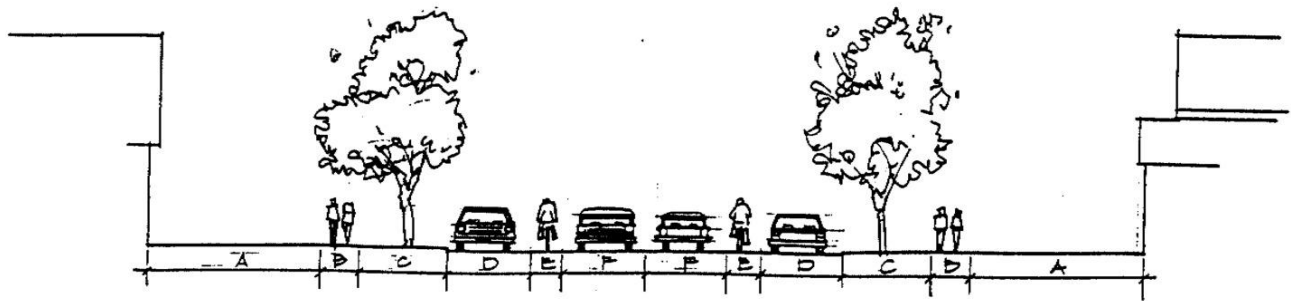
Schematic sketch of a typical collector street cross-section. Table 7-1 lists the recommended dimensions of each component: A) building setback from street right-of-way; B) walkway; C) planting area; D) parking lane; E) bicycle lane; F) travel lane.
